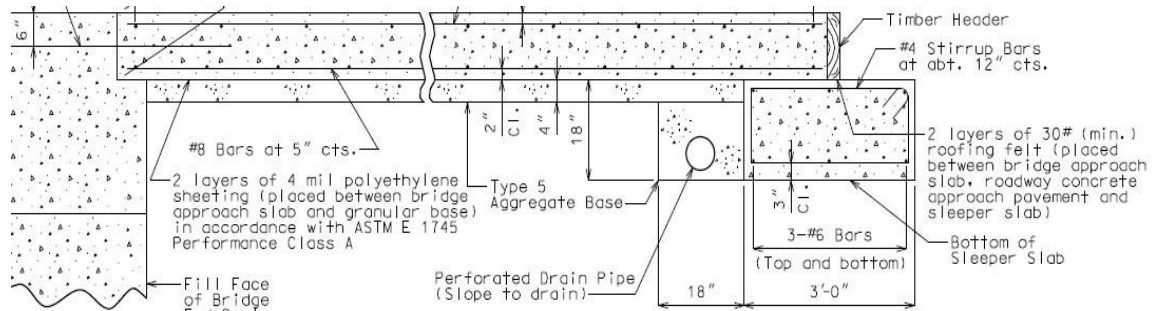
Section View of bridge Approach Slab and Sleeper Slab
